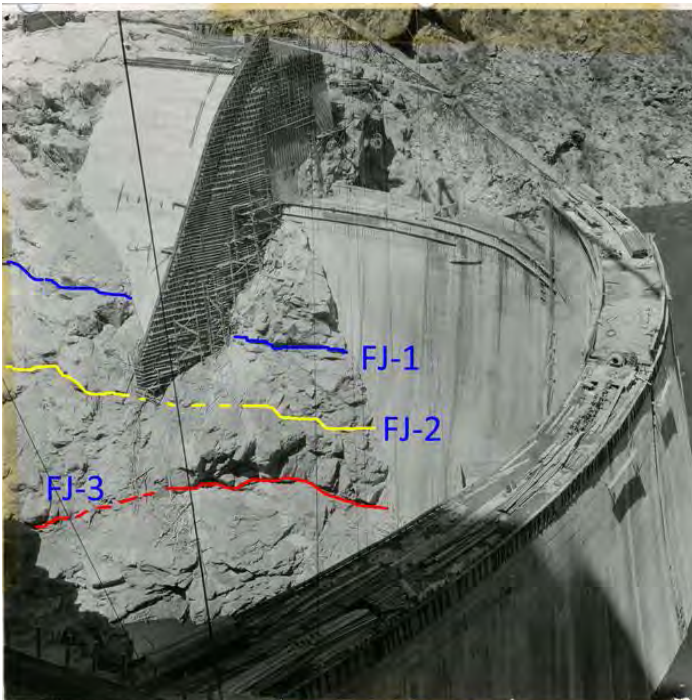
Horse Mesa Dam during construction, showing three previous joints (labelled FJ-1, FJ-2, and FJ-3).
